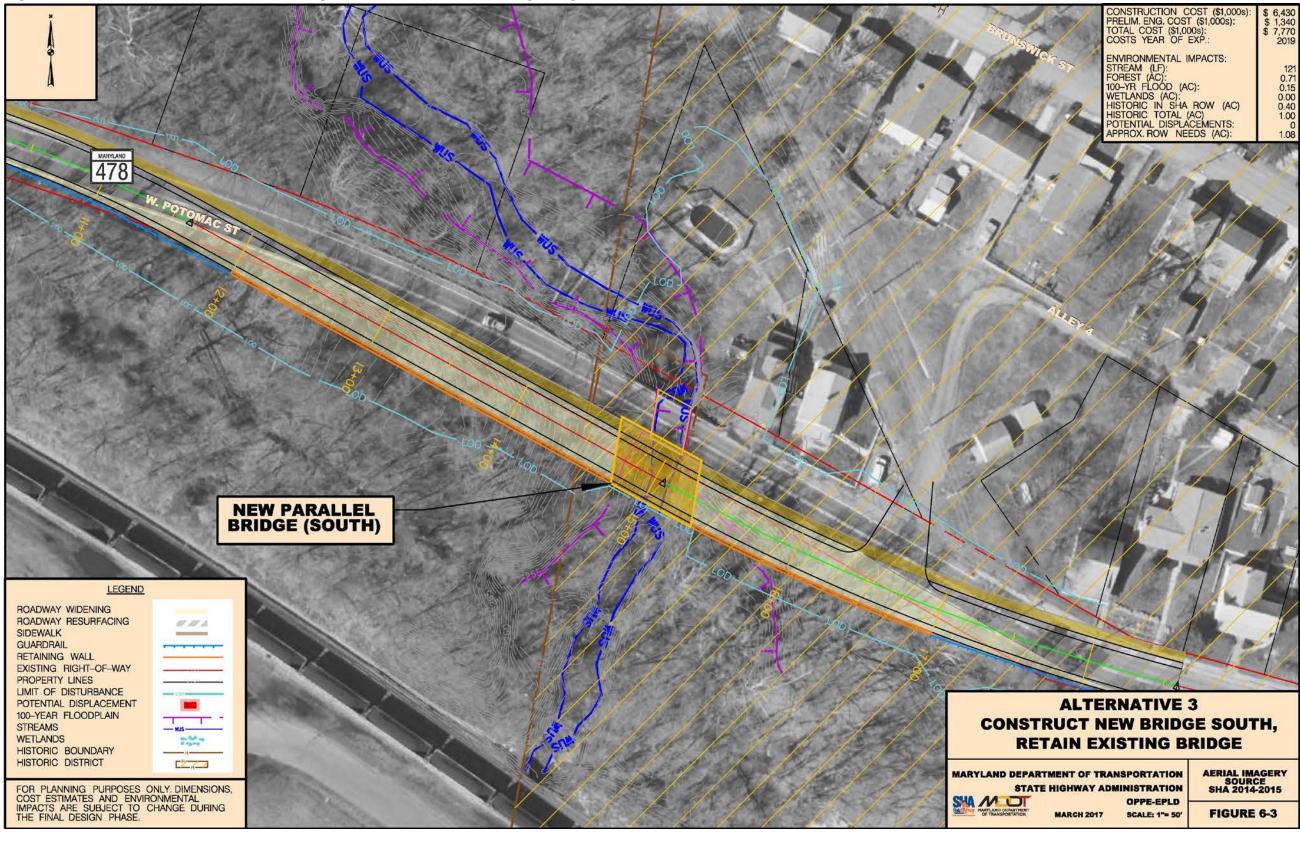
Alternative 3: Construct New Bridge to the South, Retain Existing Bridge
